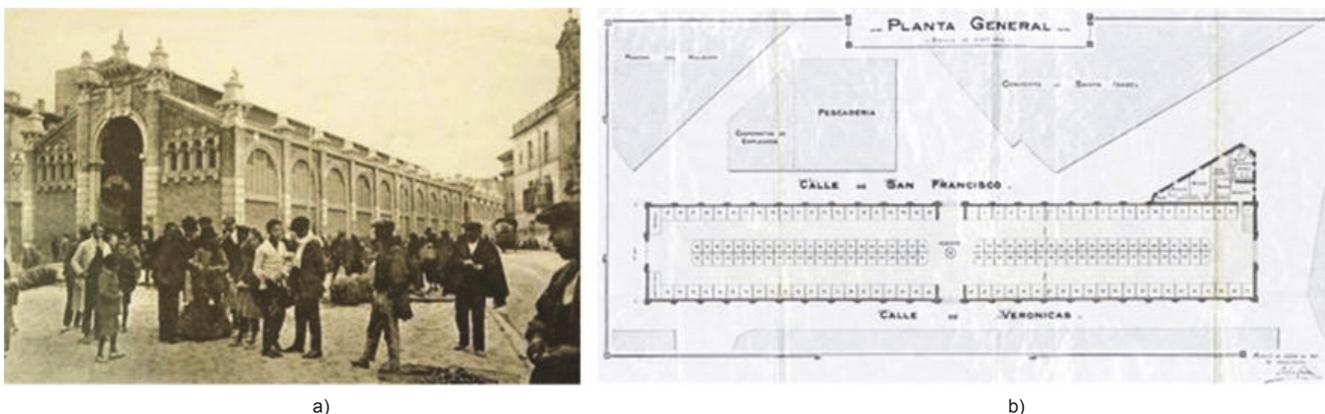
Original building (source: historical archive of Murcia): a) vintage photograph (1916); b) original plan of the plant configuration.
